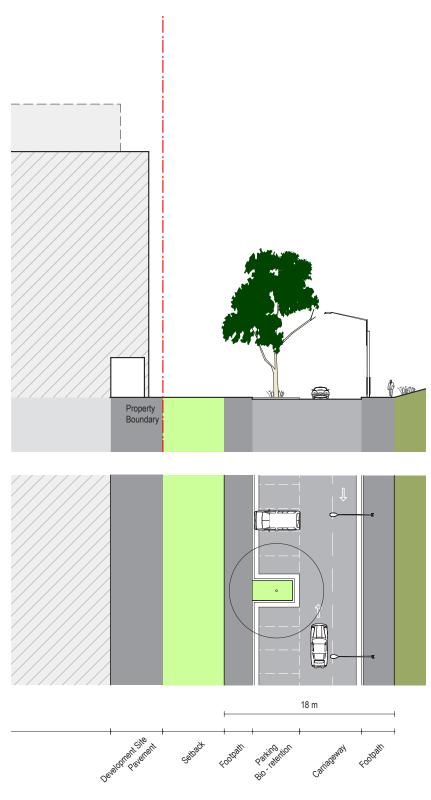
Shane Gould Avenue East – Typical Section and Plan View West
